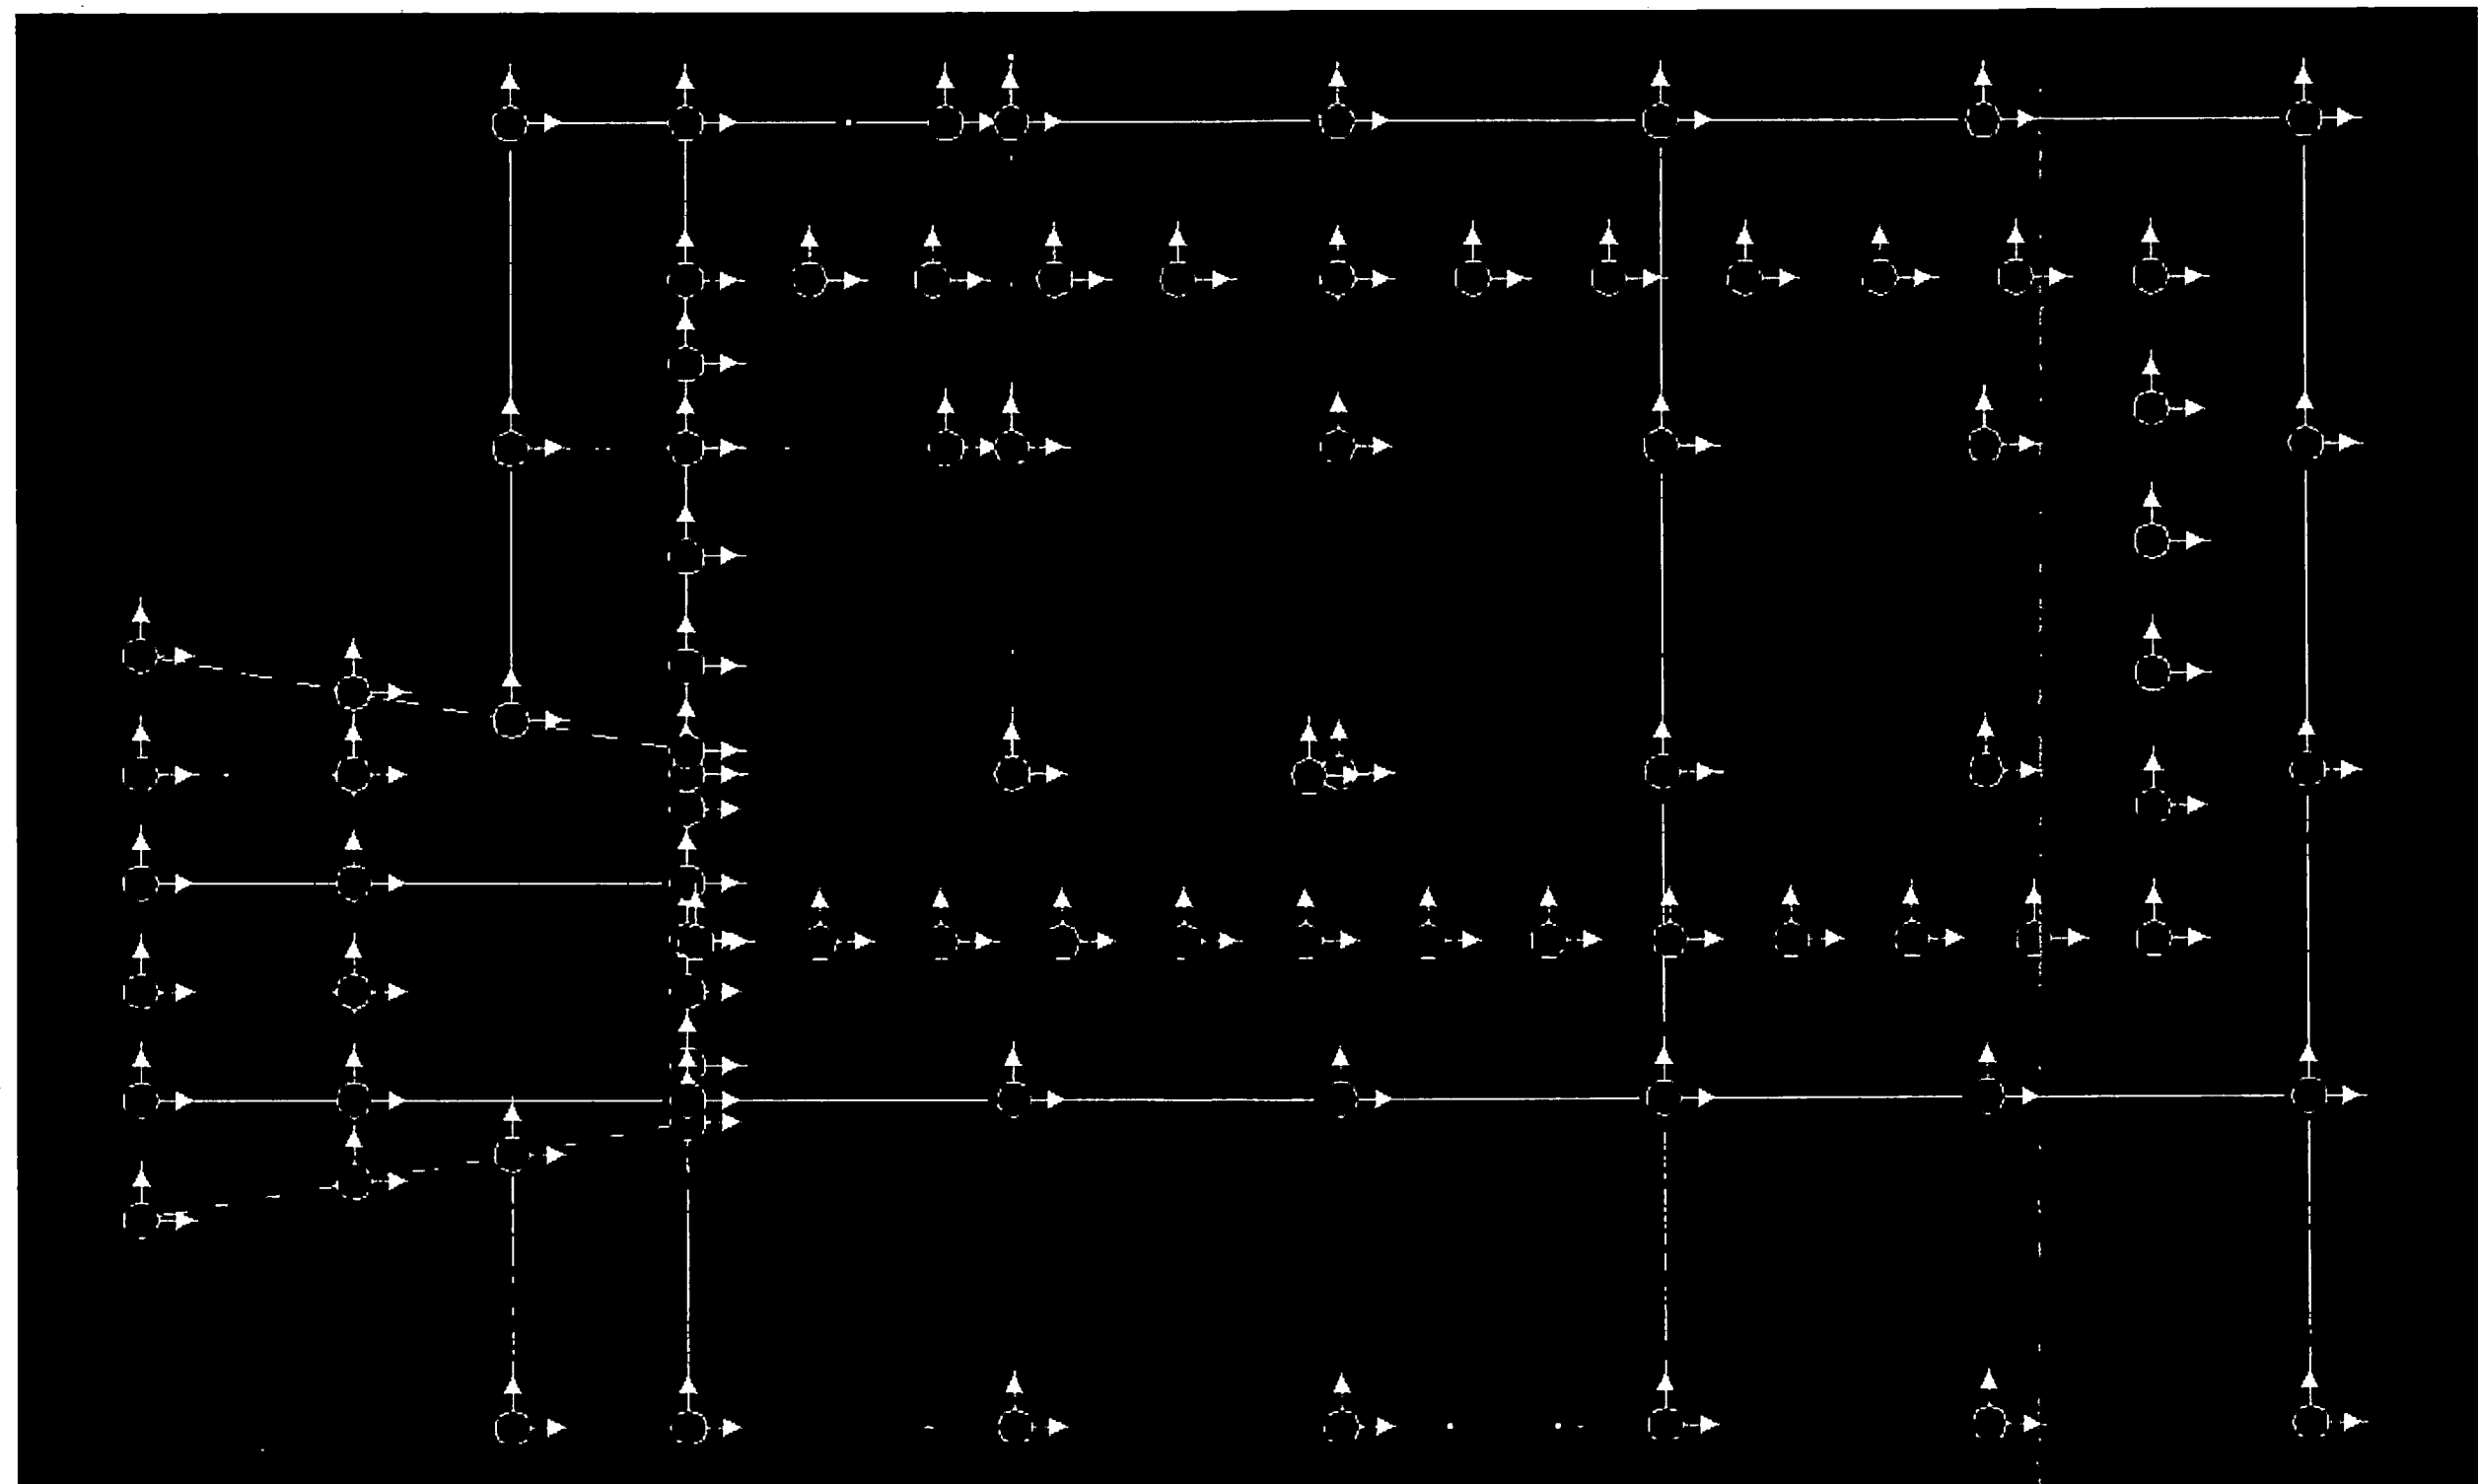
PERFORM-3D Model 1st Floor Plan View, Diaphragm Definition (H1, H2, RV Constraints)
